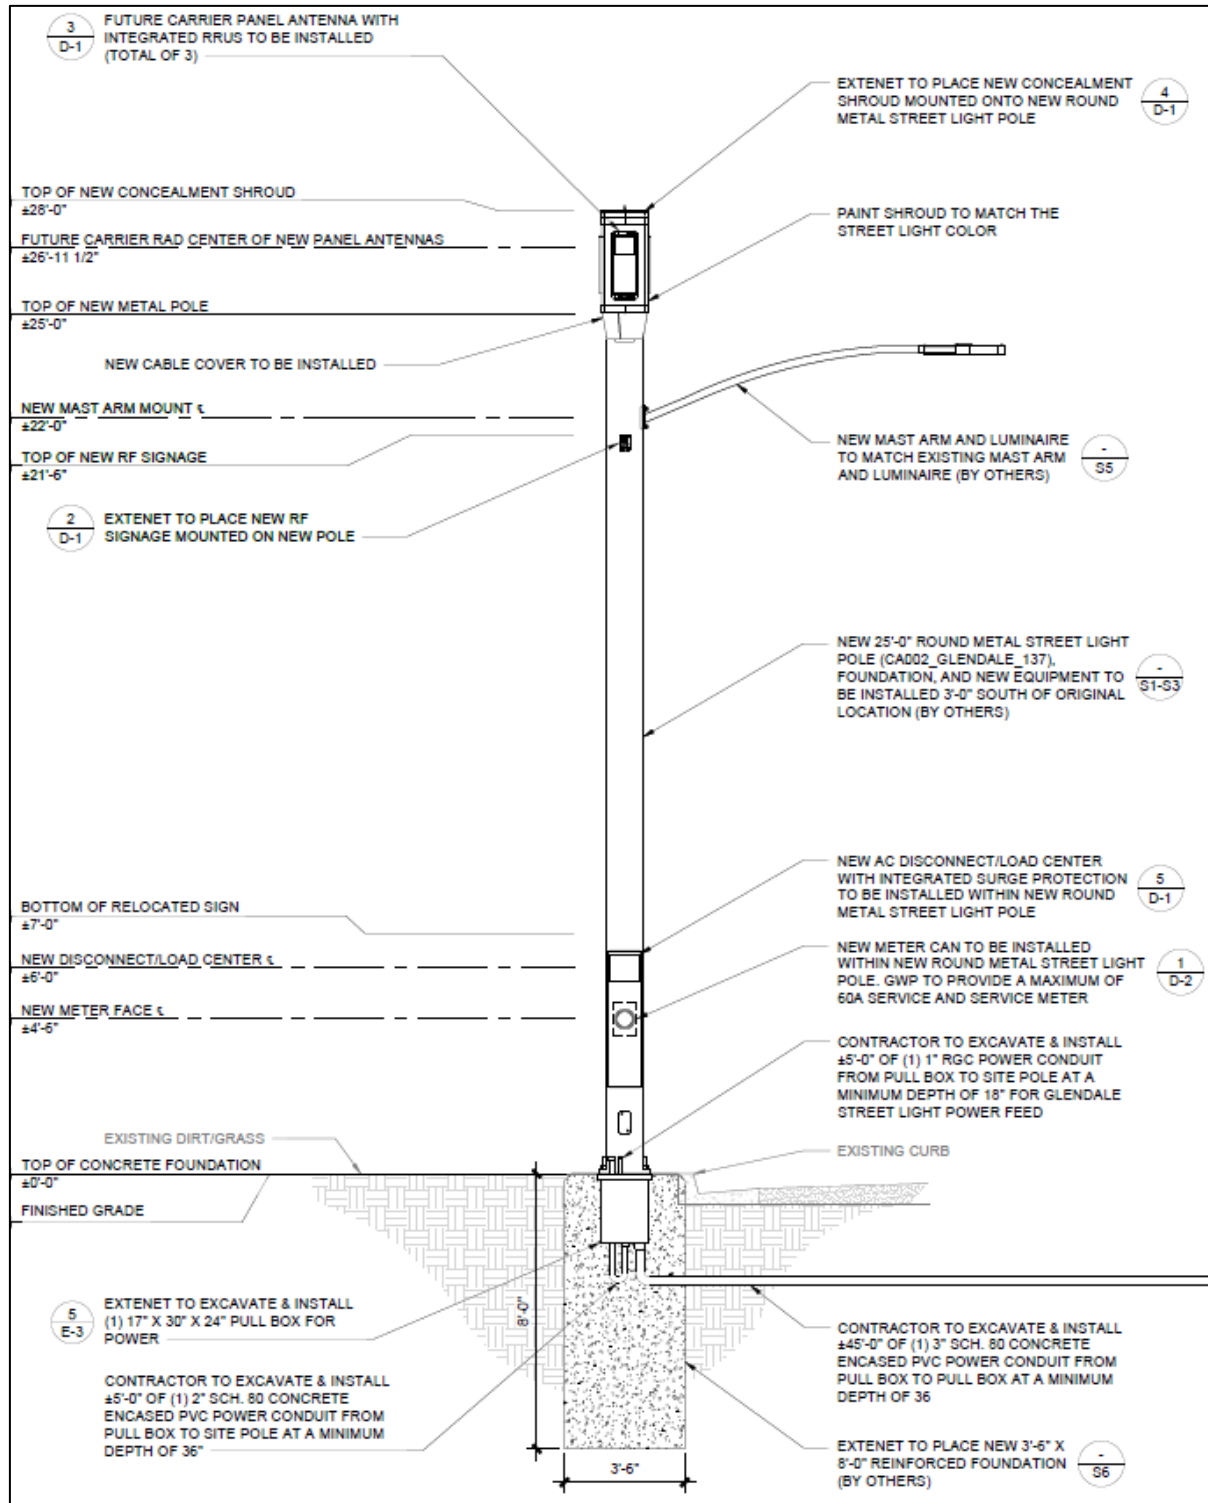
Proposed elevation view from the north (Source: Plans, Page A-3, panel 2).
